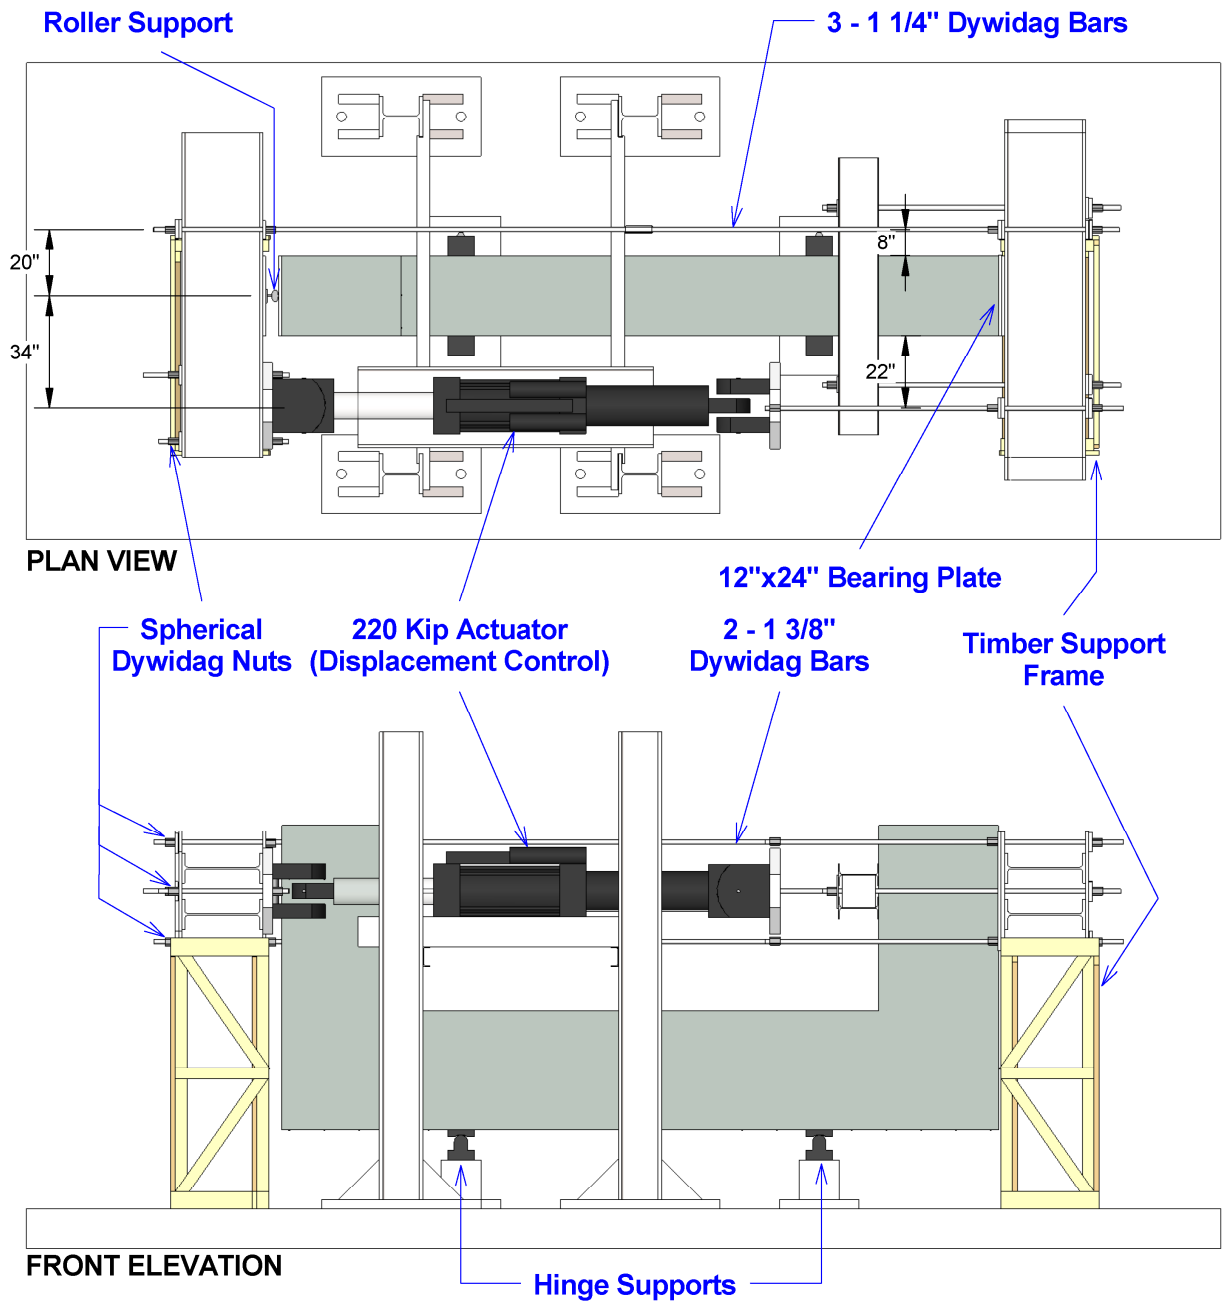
Plan and Front Elevation View of Experimental Setup for Specimen 3.
